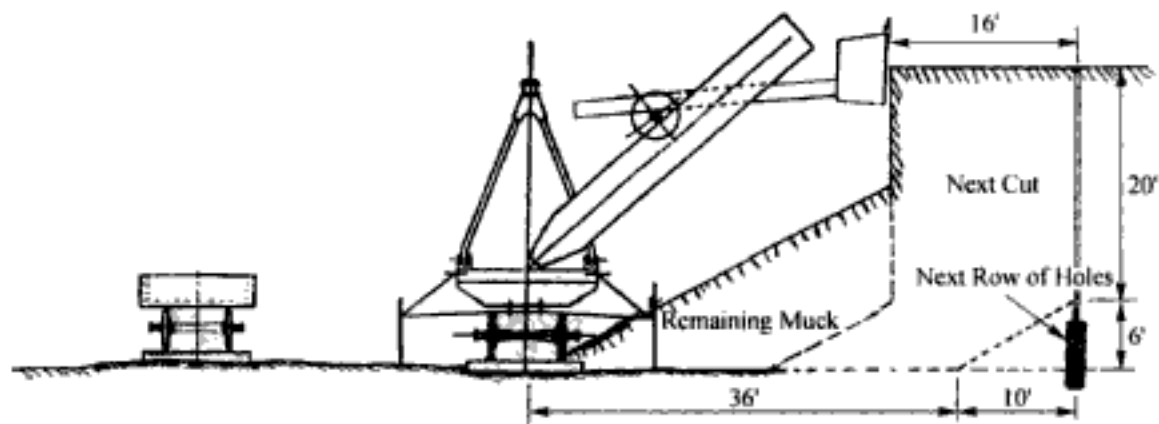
A typical cross-section showing the bench geometry when loading ore at the Sellers Pit. (Bucyrus, 1911).
